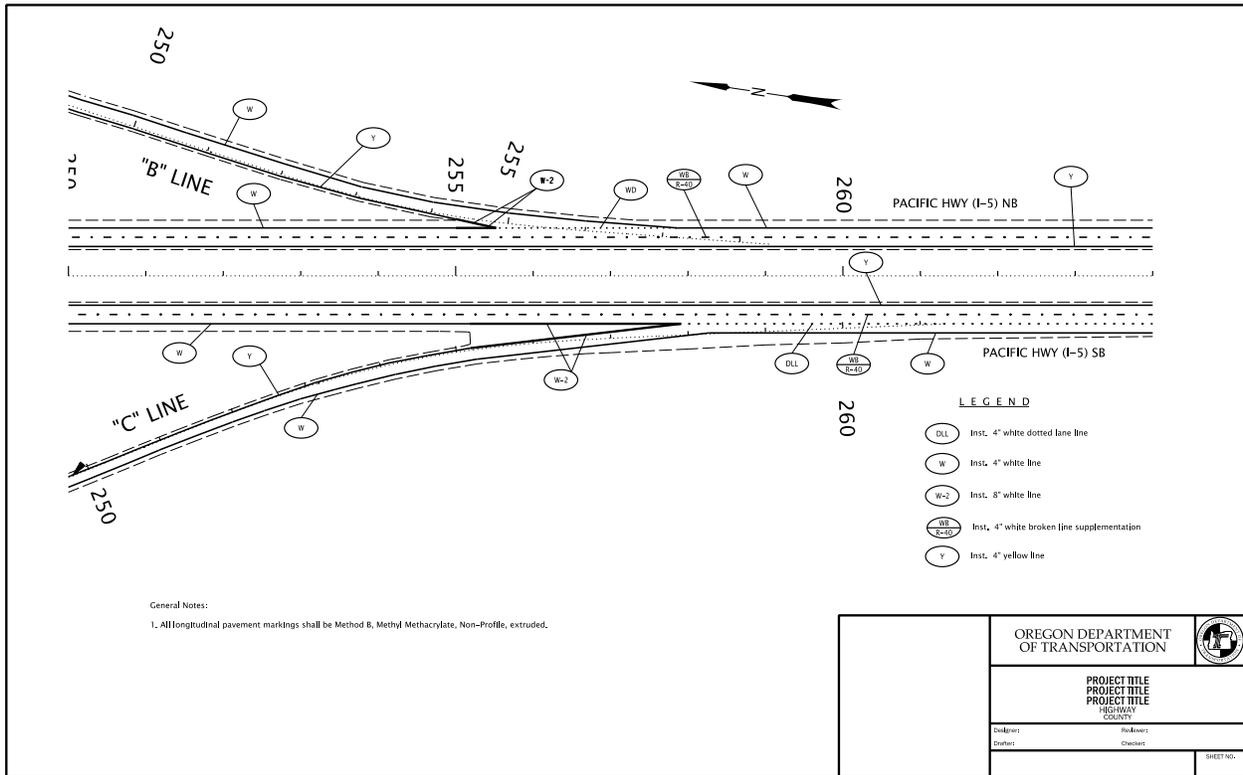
is an example of a pavement marking plan sheet file without the design file referenced. It contains bubble notes, title block, border and general notes.
